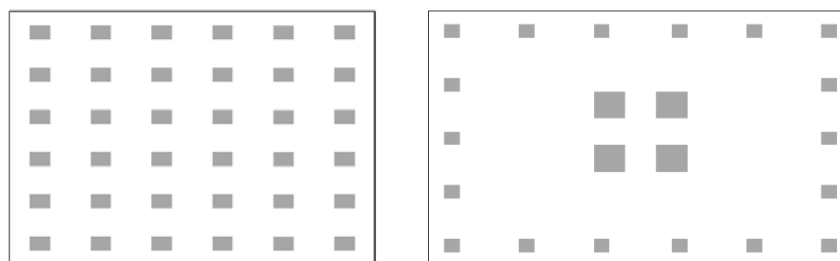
Plan view of a traditional grid of columns placed regularly (left) and a tube framed structure (right) (source: author, 2020)
